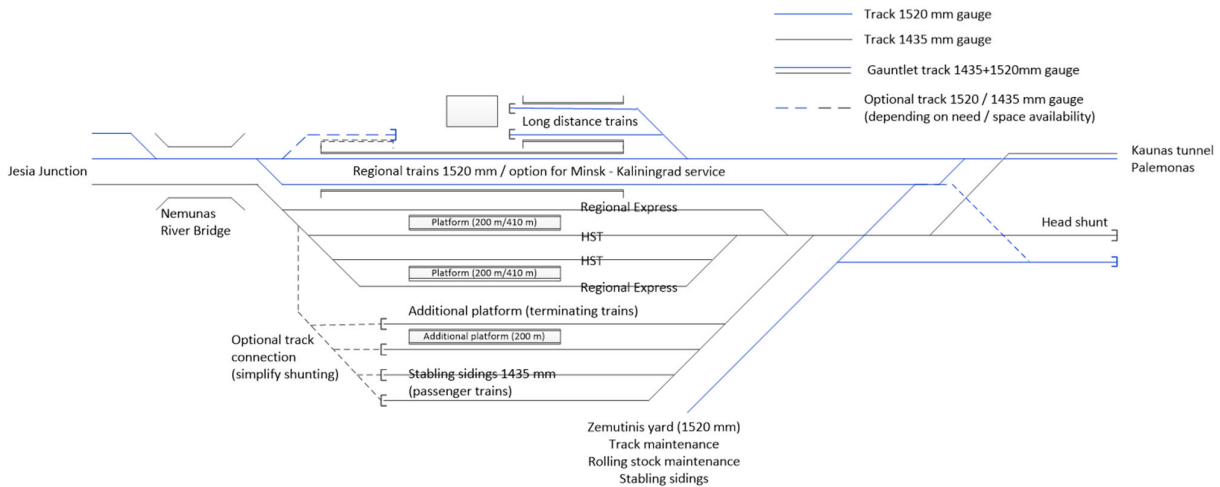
Track layout Kaunas main station – minimum requirements for operational plan
